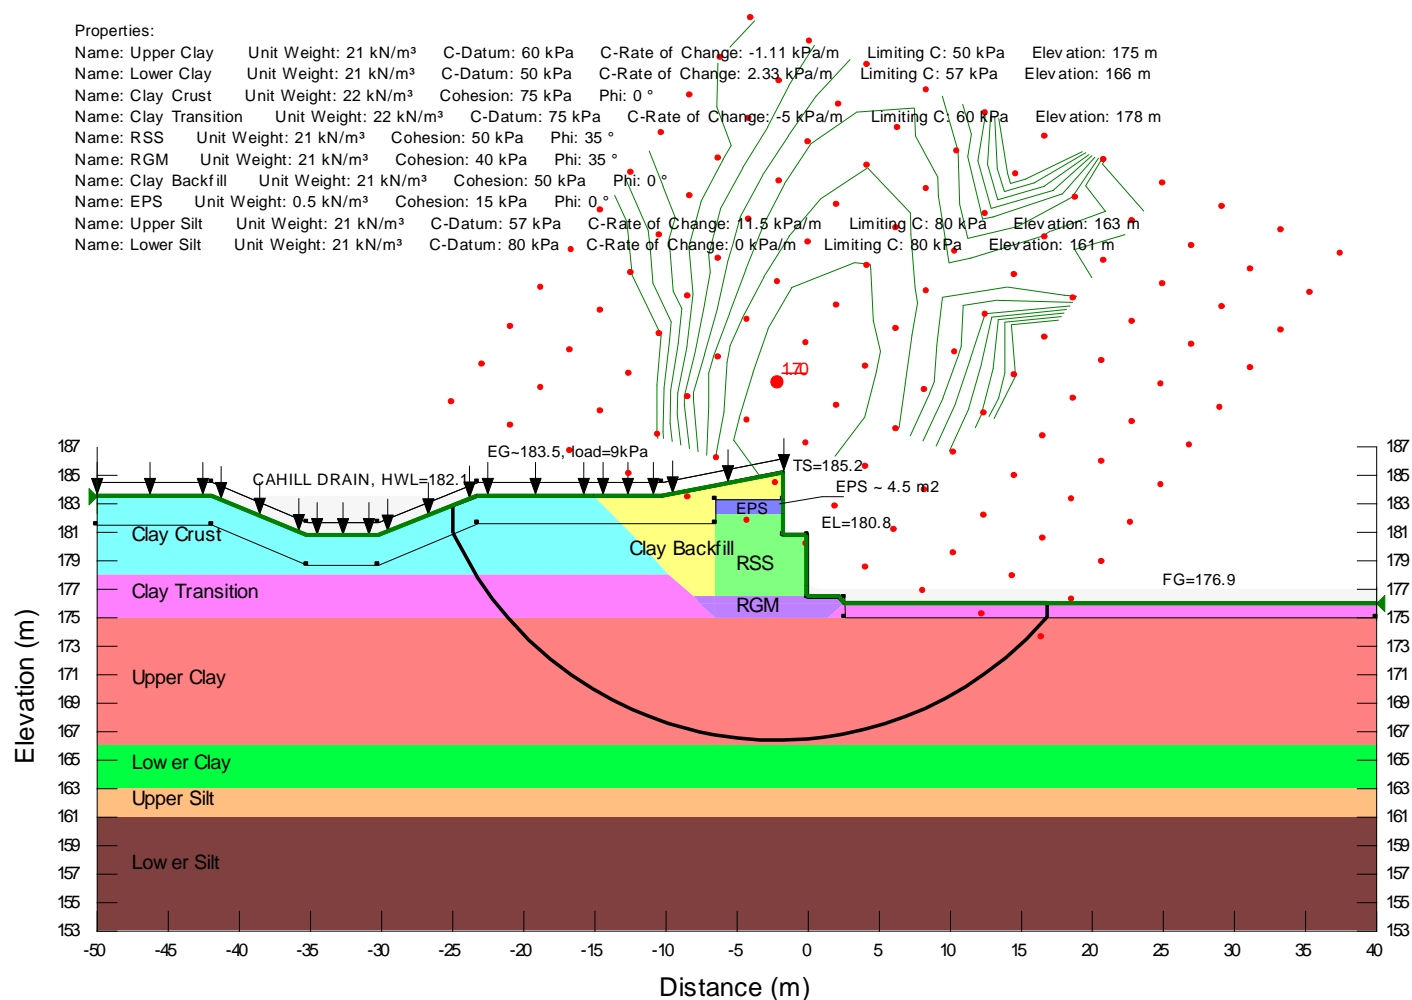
Global Stability Result – North Abutment (East Segment) – End of Construction (Undrained) Loading
